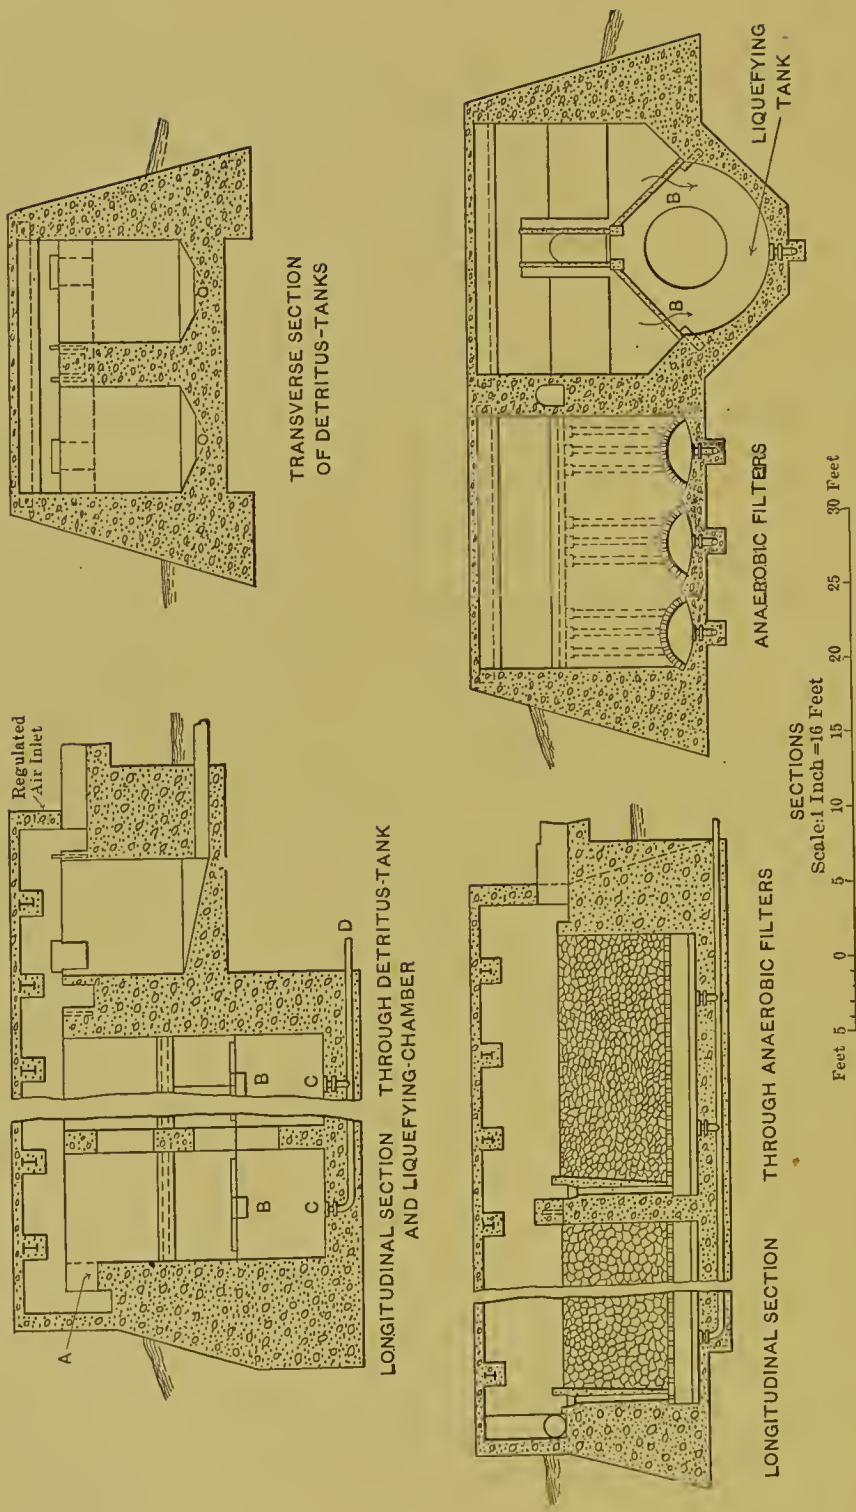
Sections of the Hampton Hydrolytic Tank and Filters (courtesy of W. Owen Travis).
